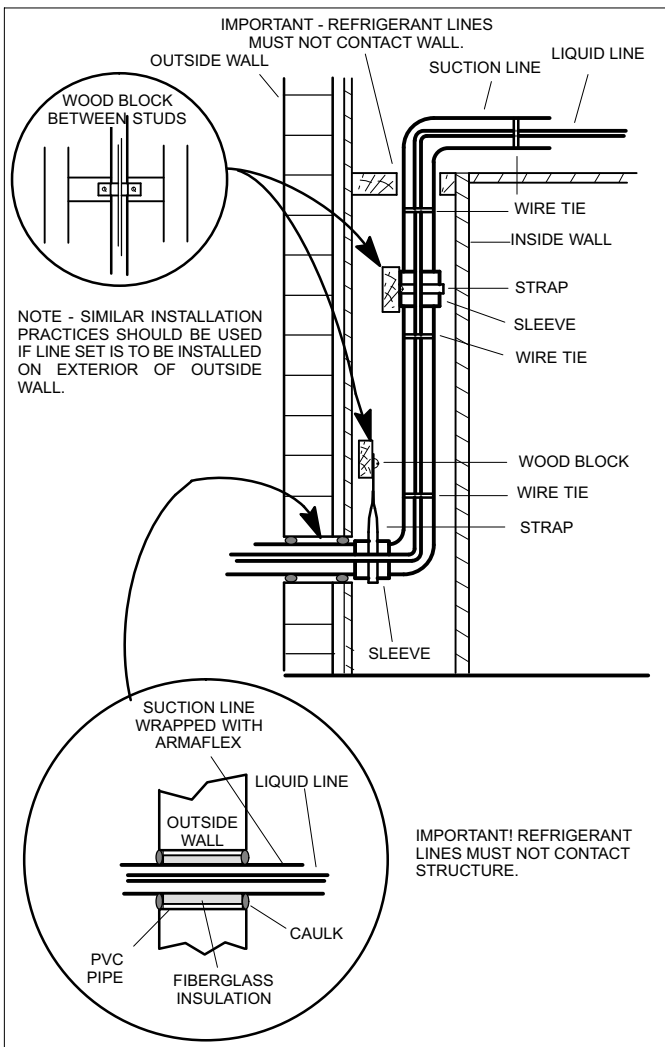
Refrigerant Line Set: Installing Vertical Runs (New Construction Shown)
